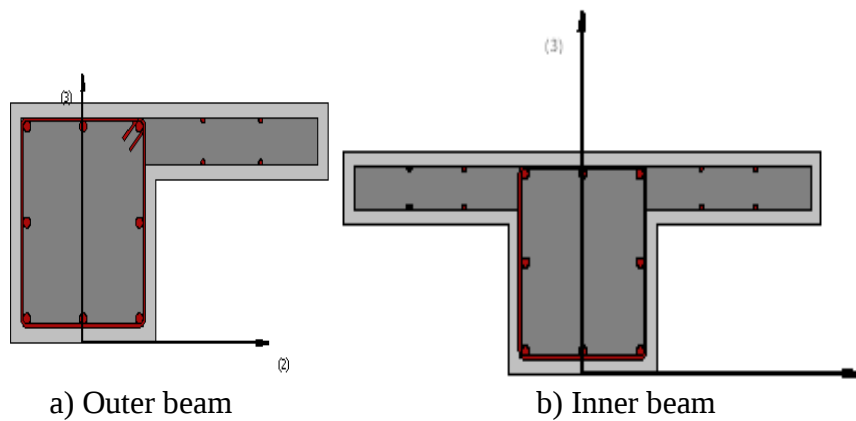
T-beam section 0.4x0.35 (8 No.18) for 4 story building: a) Outer beam and b) Inner beam.
